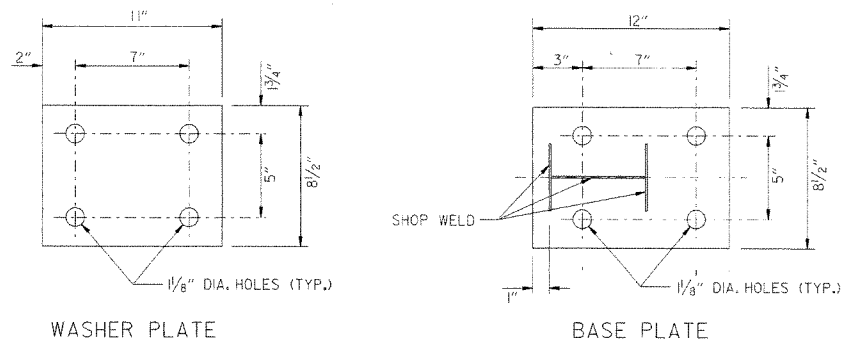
DETAILS OF WOOD LINE POST CONNECTIONS (W-BEAM)
